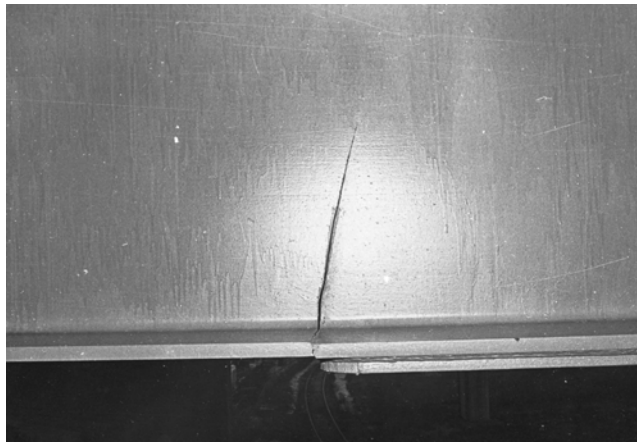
Yellow Mill Pond Bridge: Fatigue Crack at the End of Cover-plate
